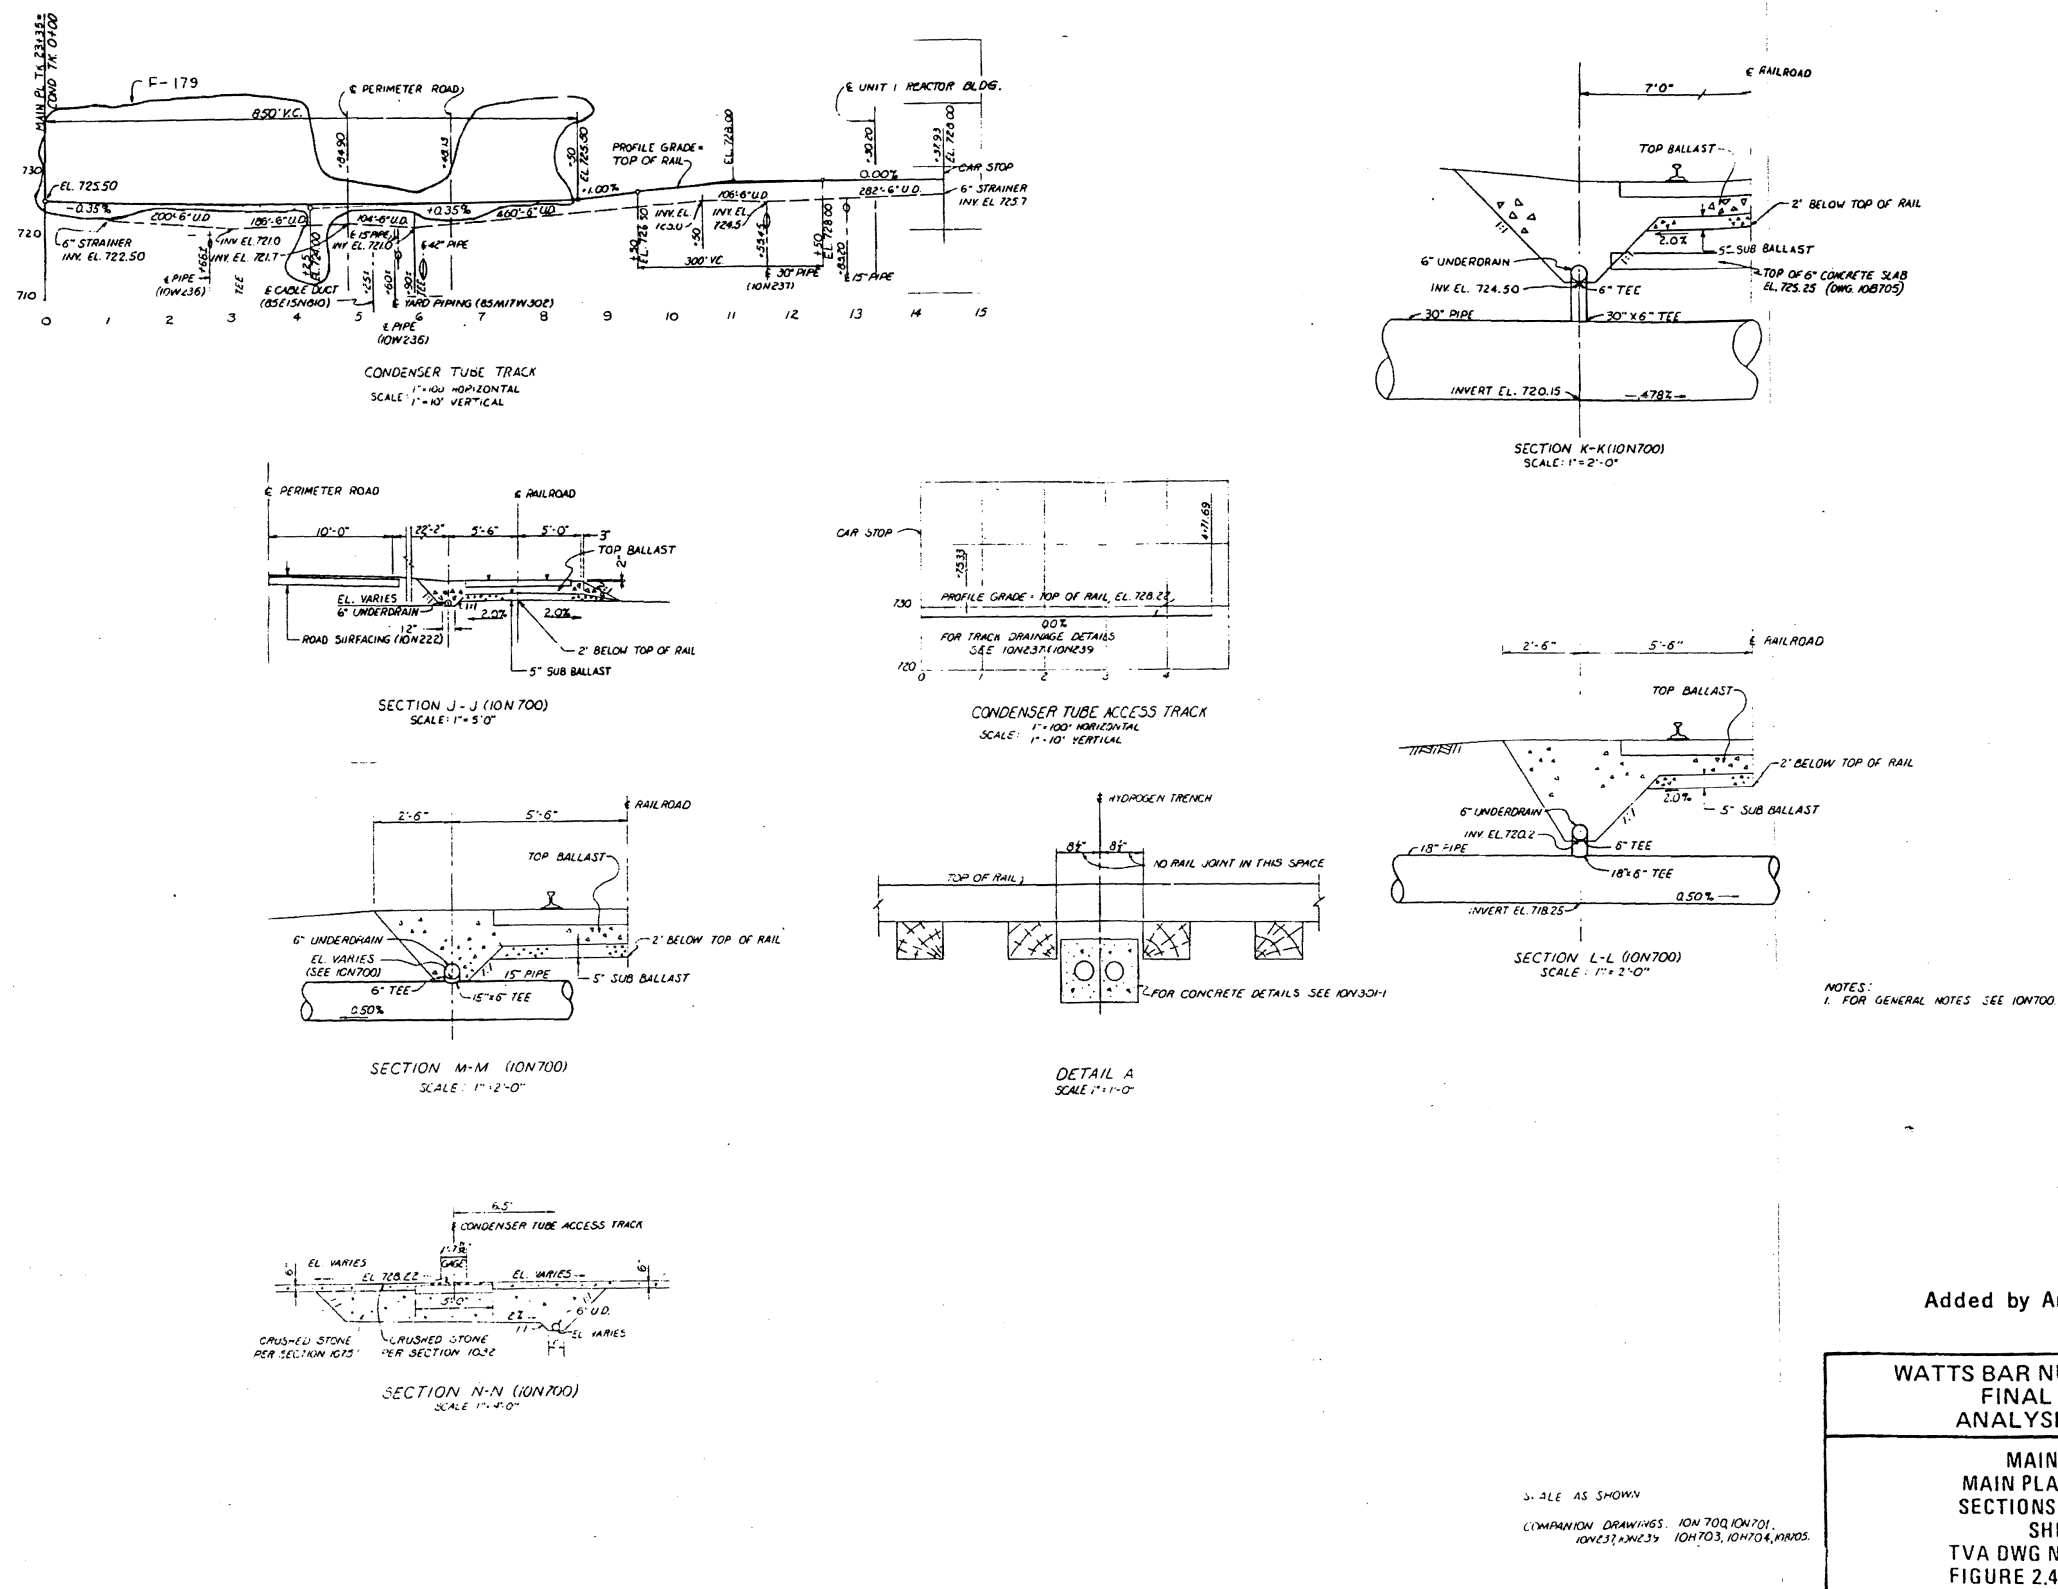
Main Plant Main Plant Tracks Sections & Profiles - Sheet 3
